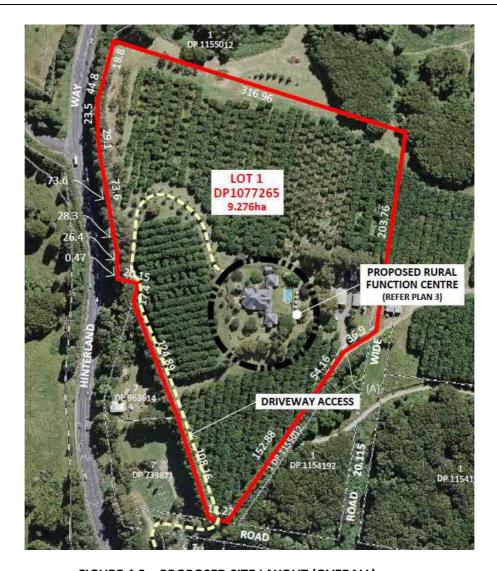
PROPOSED SITE LAYOUT (OVERALL)
